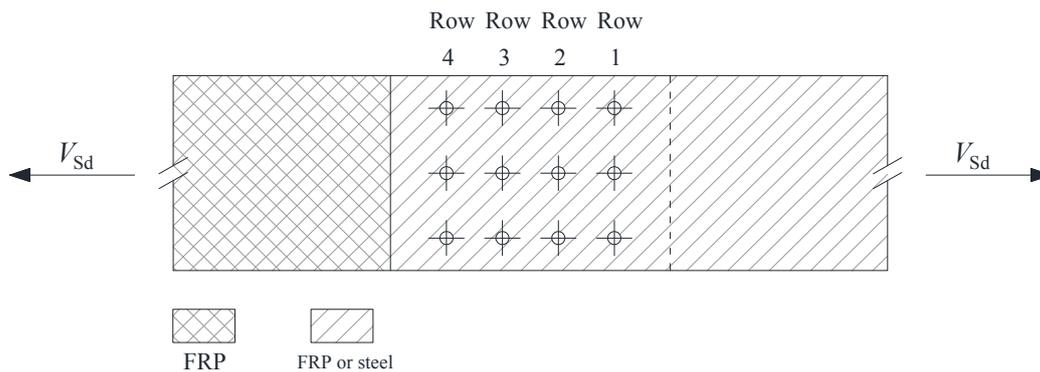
Layout of a multi-bolted joint between two elements of which at least one of FRP material.
